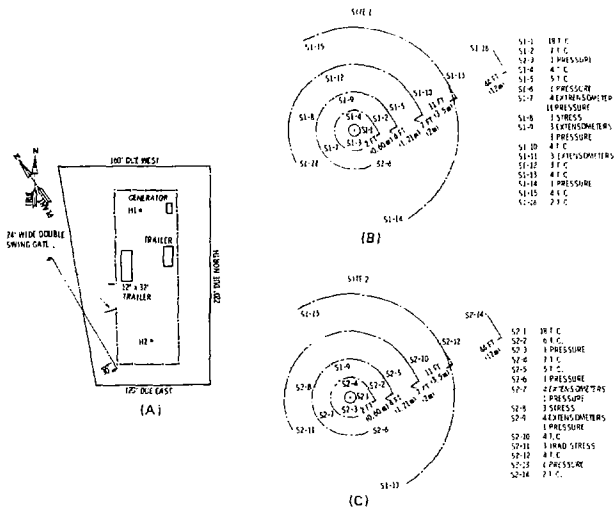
(A) Overall Site Layout, (B) Experiment 1 Layout and (C) Experiment 2 Layout
